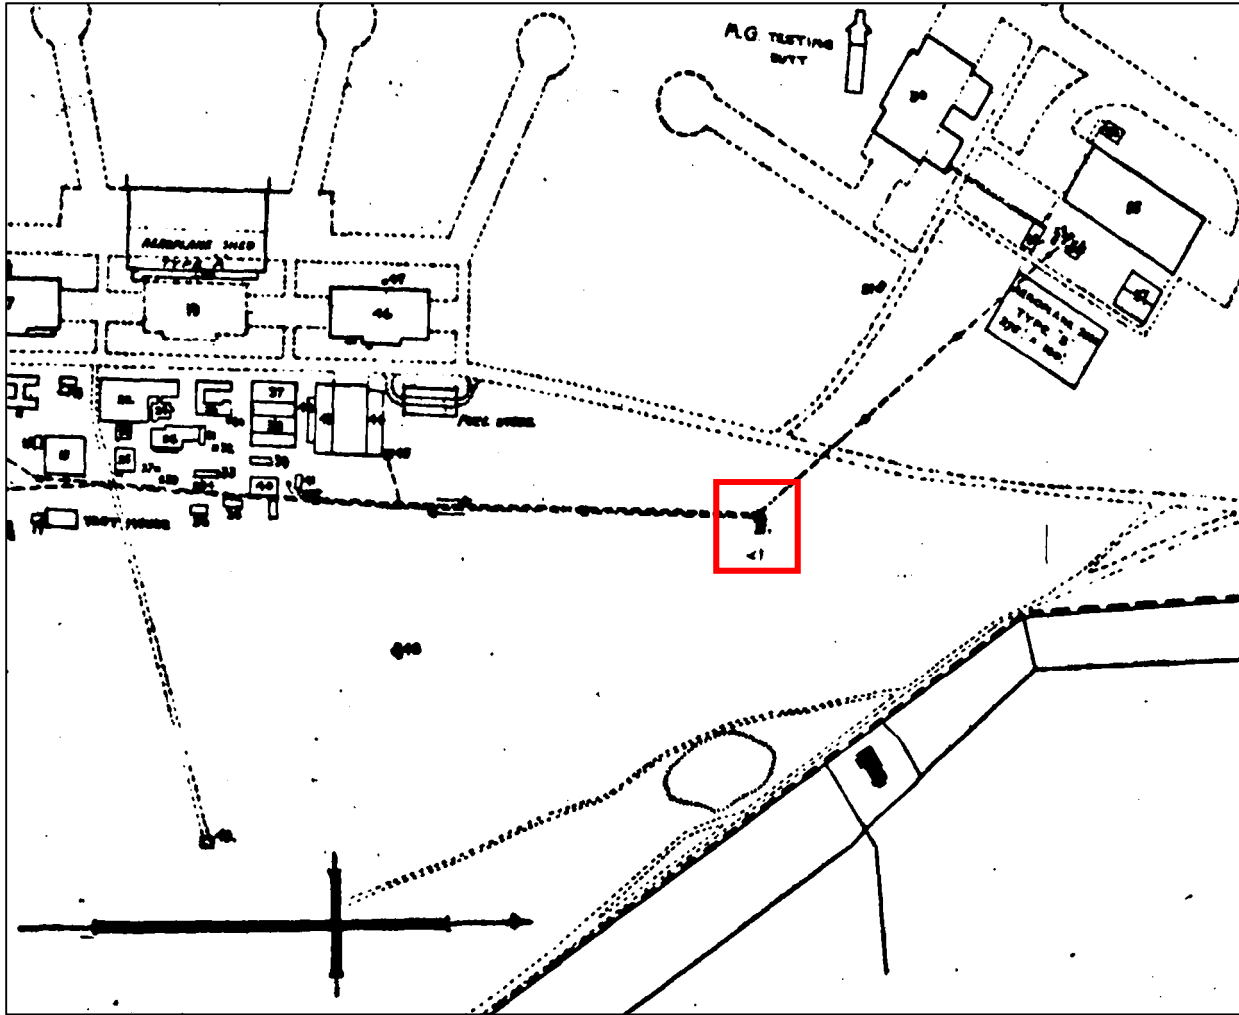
1925 Air Ministry Site Plan, building highlighted in red.
